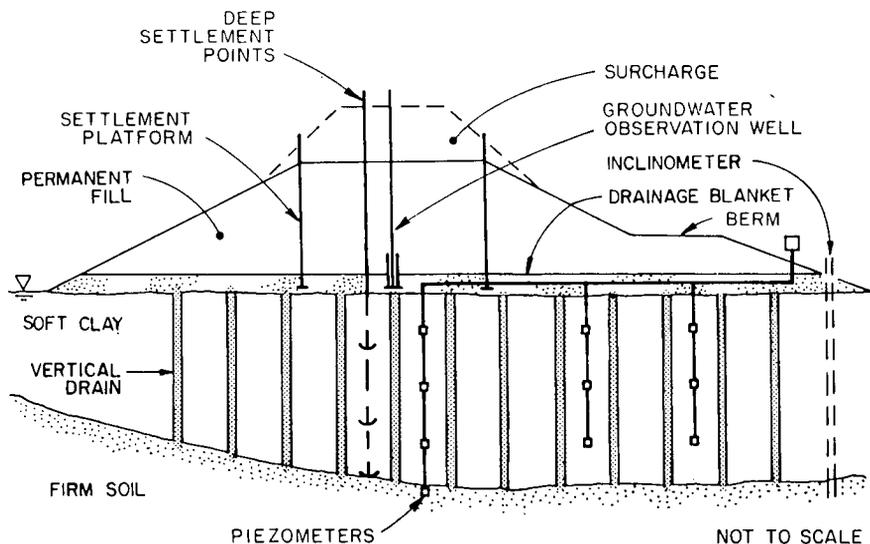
Schematic of a typical vertical drain installation for a highway embankment (86).
